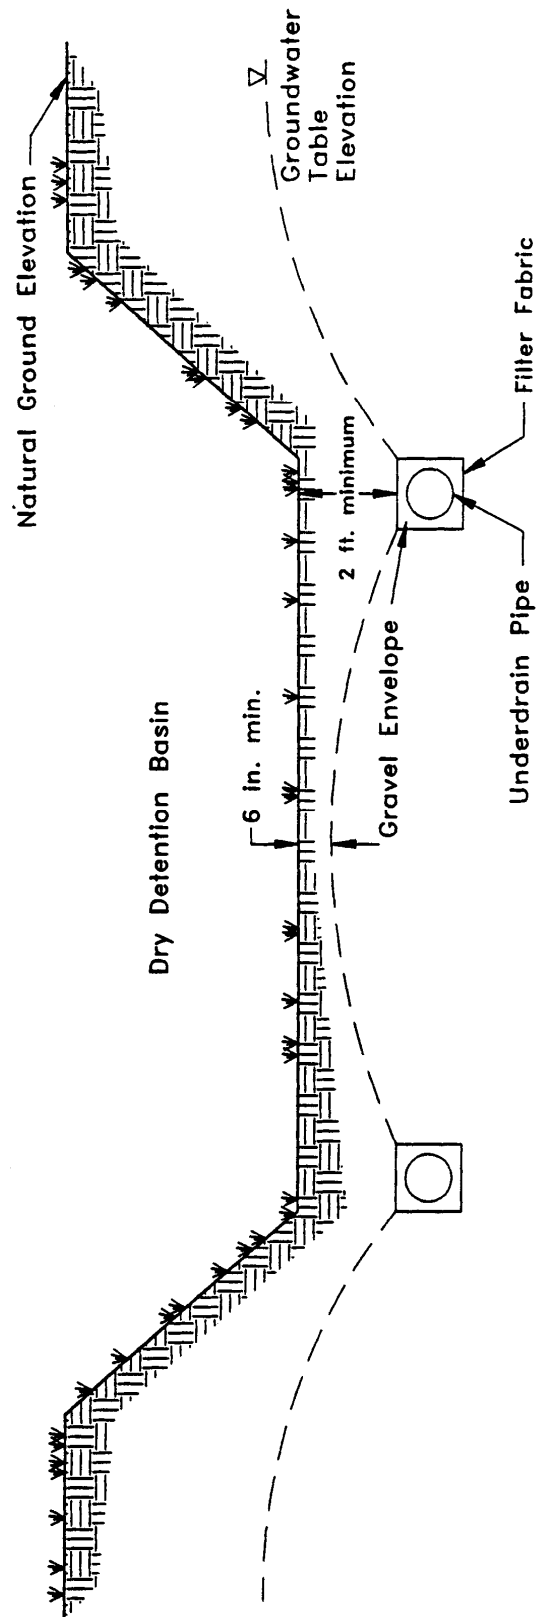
Typical cross-section of underdrain system (N.T.S.).
